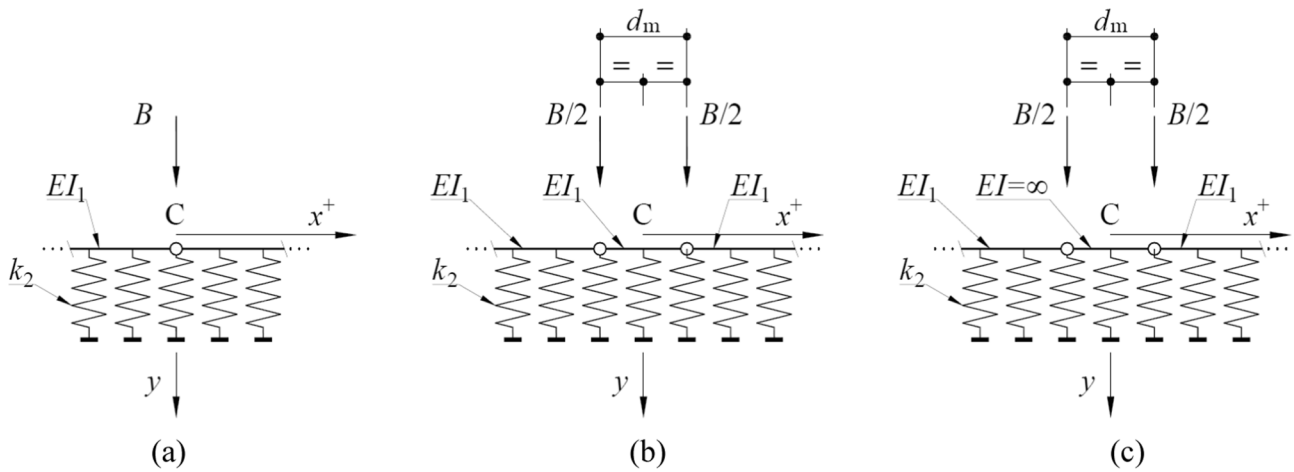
Static model of beam 1 (beam on elastic foundation): (a) load applied as a point load; (b) load applied as two point loads, deformable segment; (c) load applied as two point loads, rigid segment.
